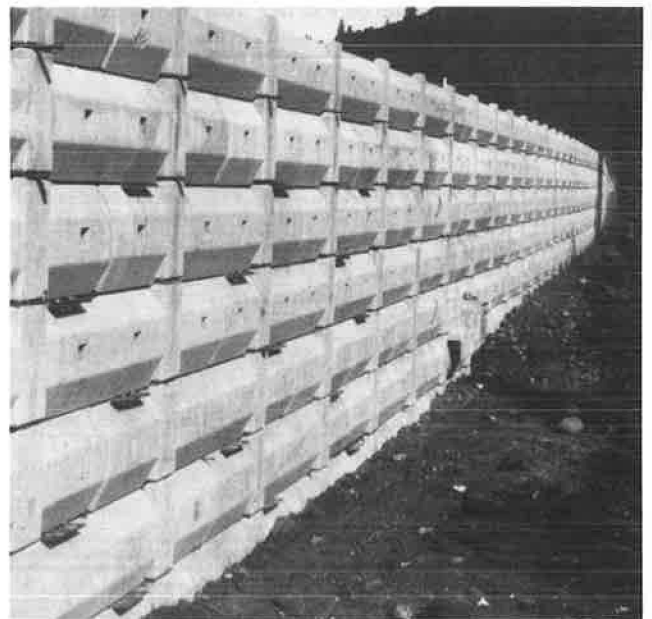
Front face of wall at instrument location 2 (wall 3) with dummy bar-mats extending from face.
